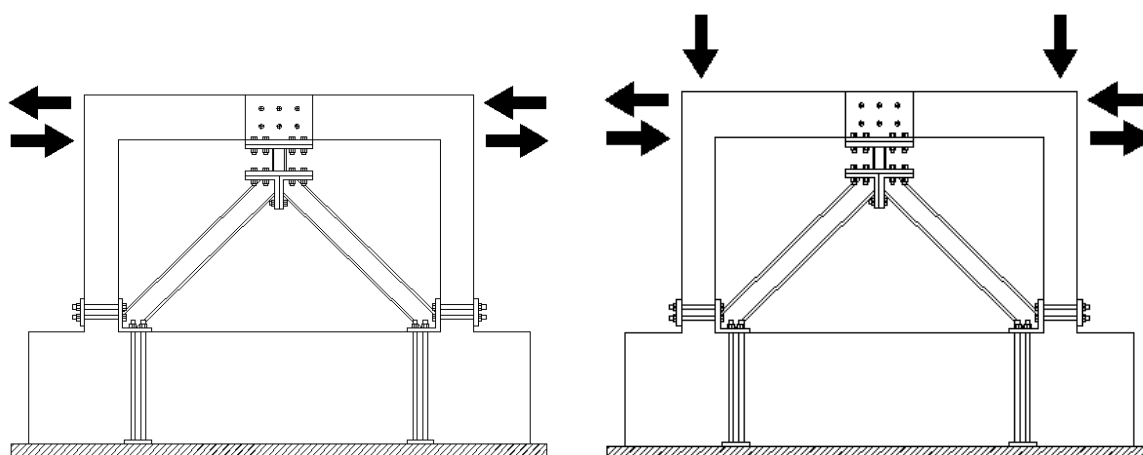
Specimens F2 and F2,N strengthened by steel bracing system and a steel link element at the top.
